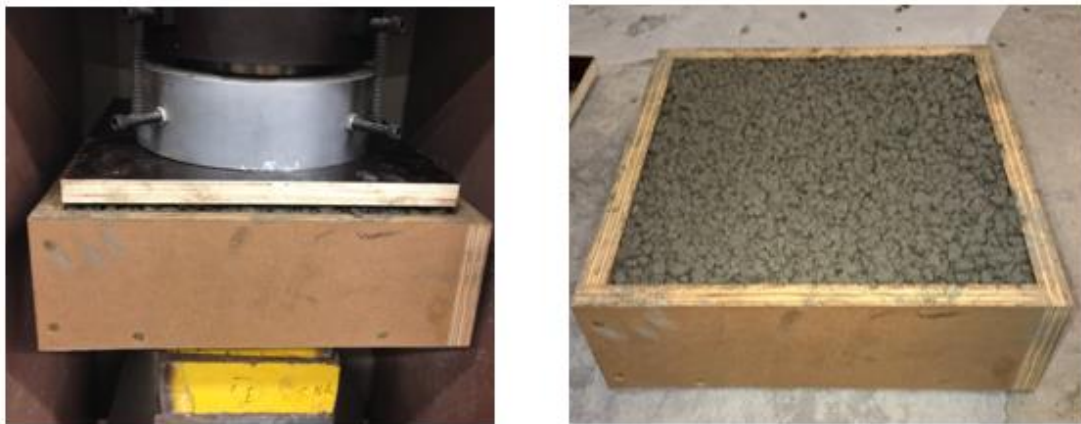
PC slab compaction in hydraulic compression testing machine (left); finished PC slab before curing (right)
